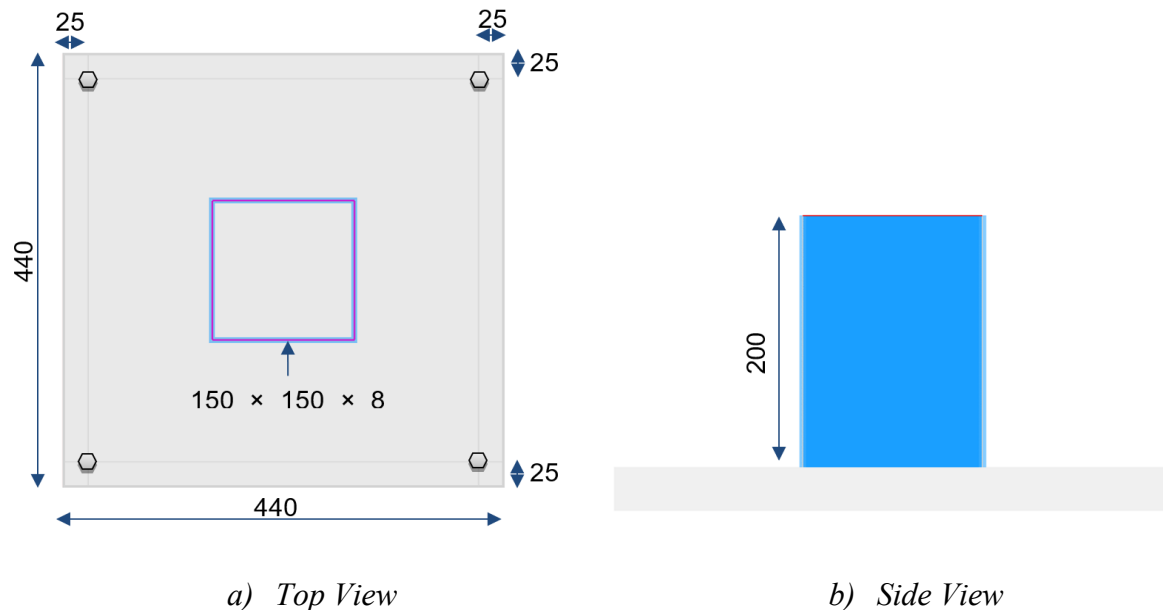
Geometric details of the base plate (All dimensions in mm)
